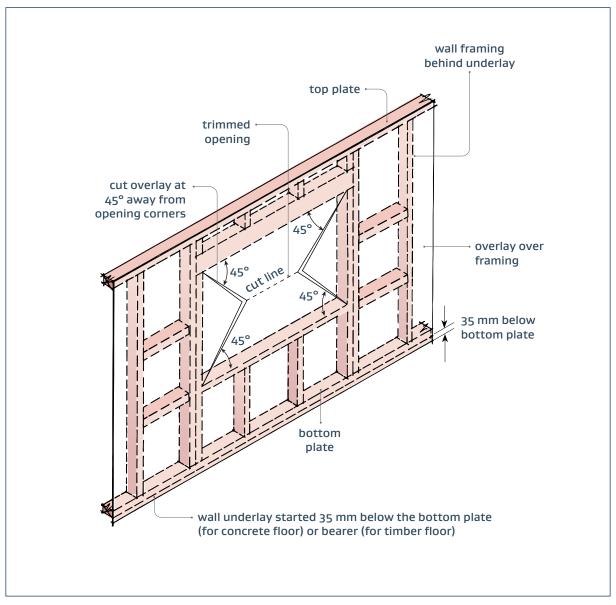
Installing wall underlay and trimming the openings (steps 1 and 2)
